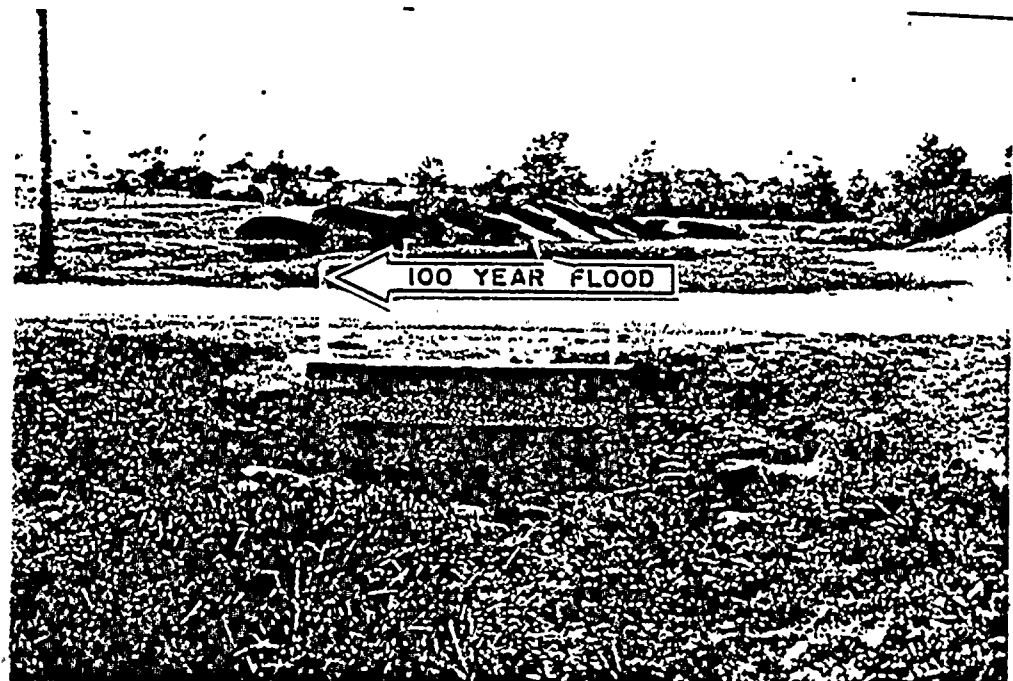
The potential 100-year flood level for Walker Creek at the upstream face of the Creamery Road Bridge, facing west.
